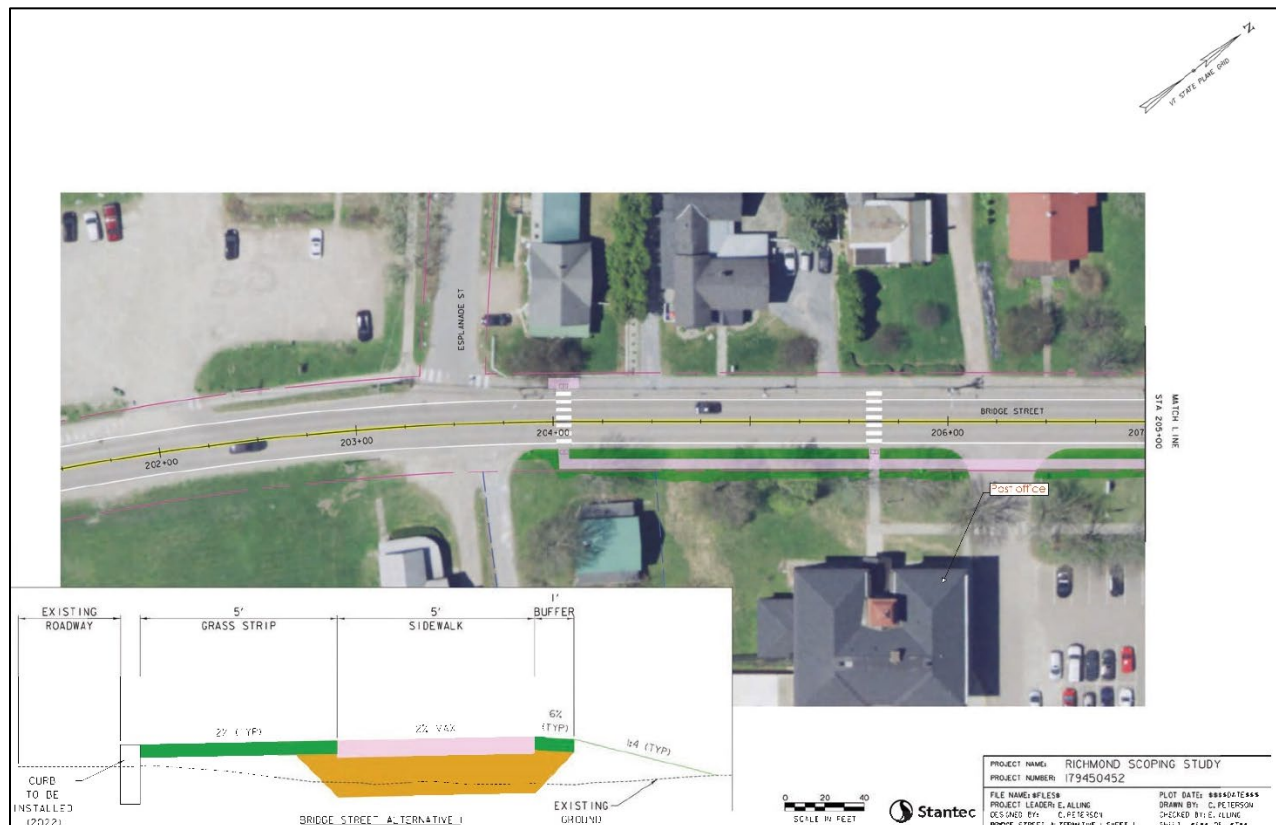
Bridge Street - Alternative 1 Typical Section
